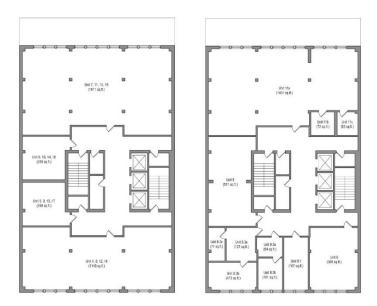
, 297 (left to right): Building 10, third floor (1921); same floor (1979). 1'' = 32'. North is up.
